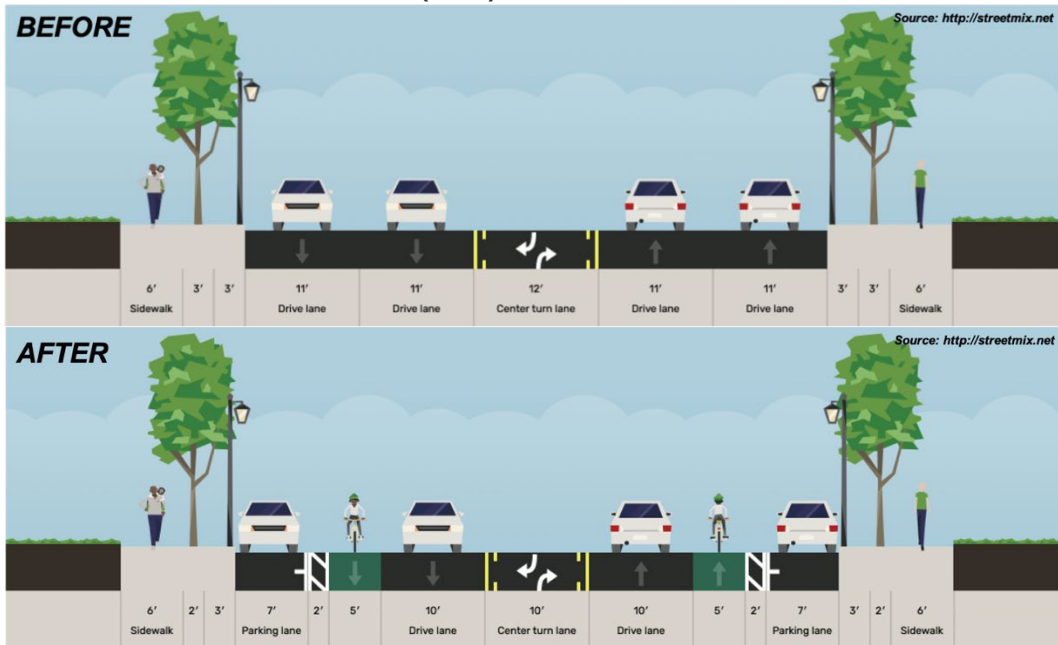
Outer Lane reconfiguration with on-street parking and buffered bike lane.
